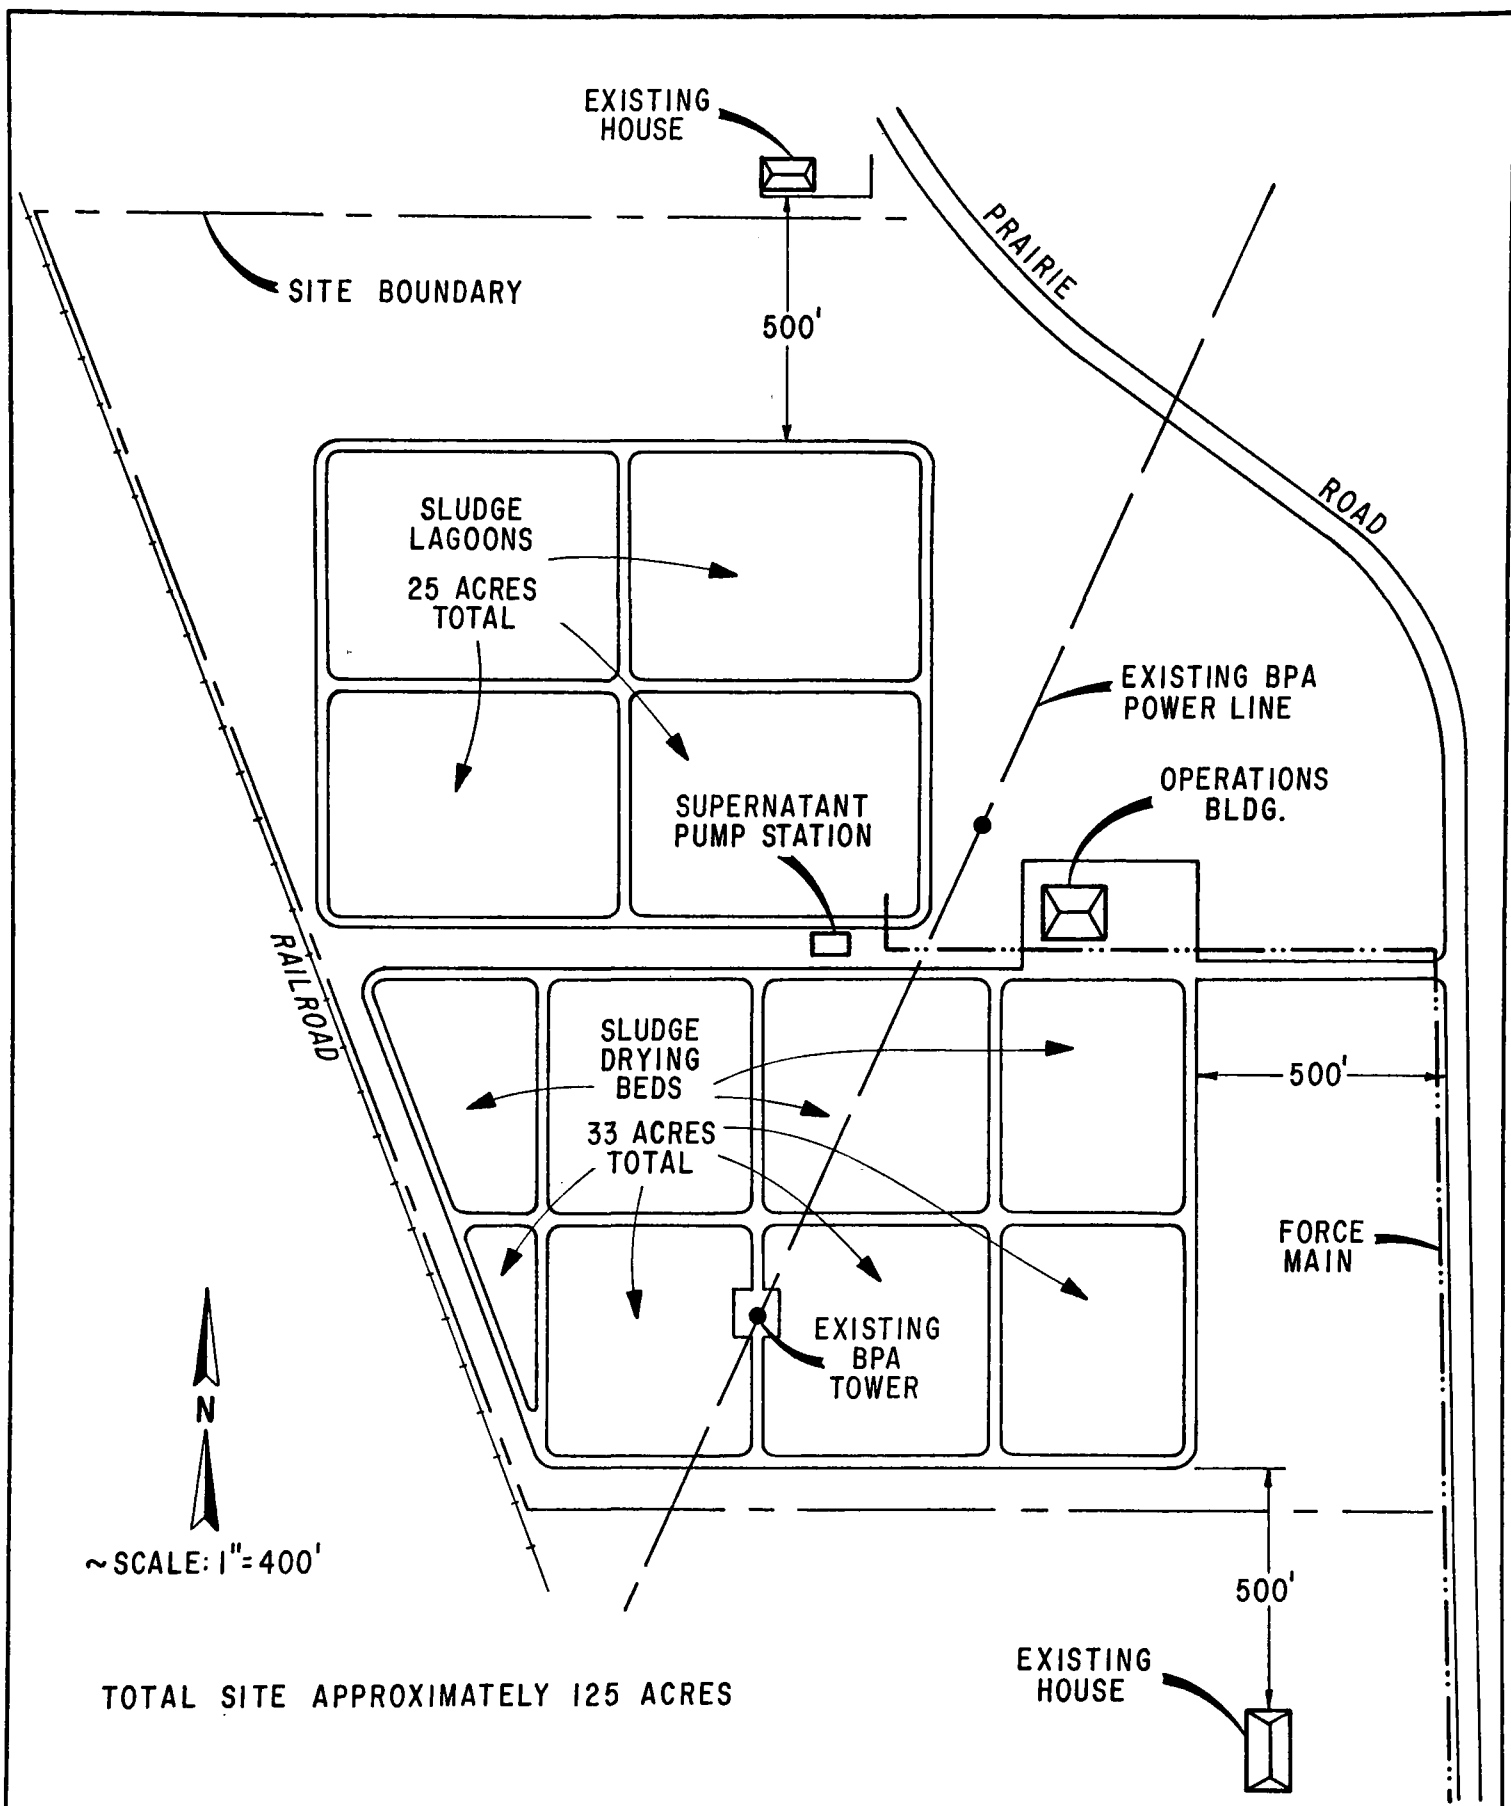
ALTERNATIVE 2 FACILITIES LAYOUT AT PRAIRIE ROAD SITE
